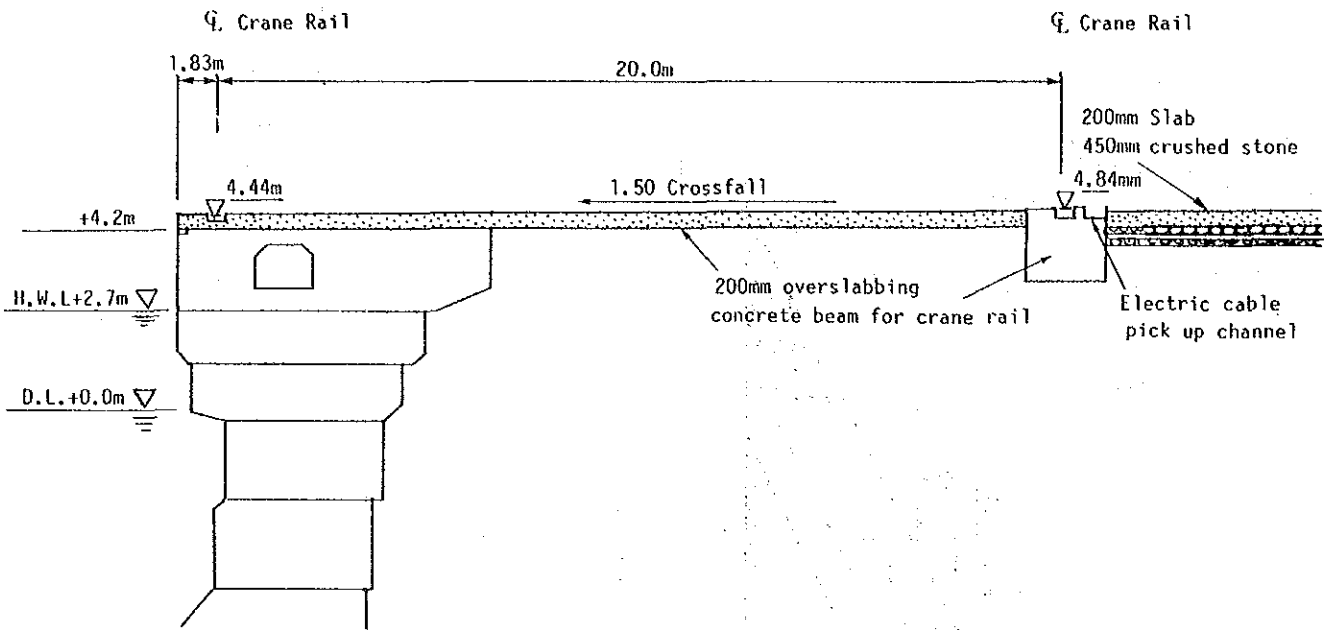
Standard Cross Section of the Crane Foundation
